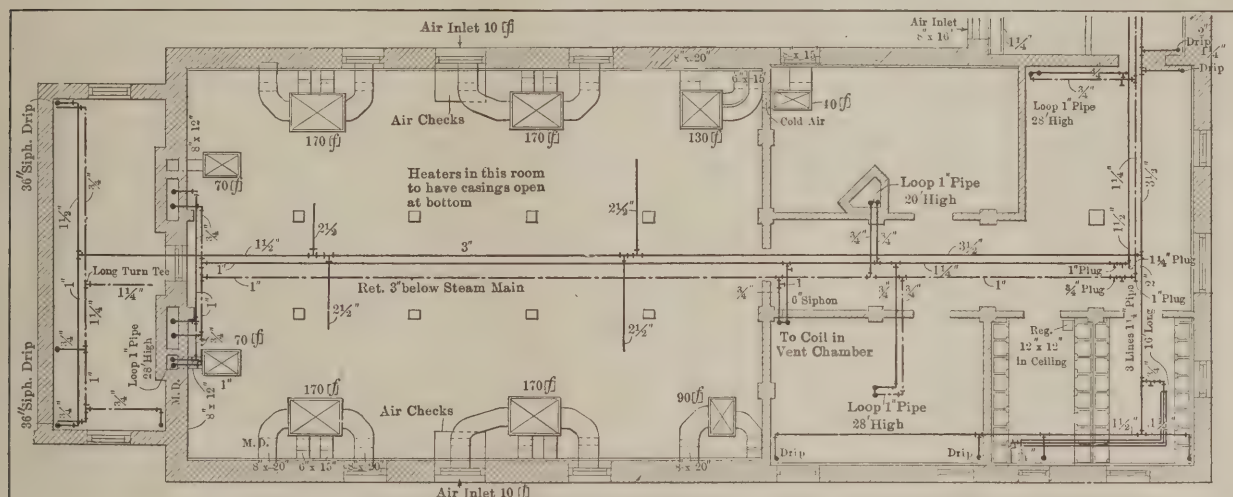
Basement Plan of Hospital, Showing Details of Gravity Steam Heating System.
